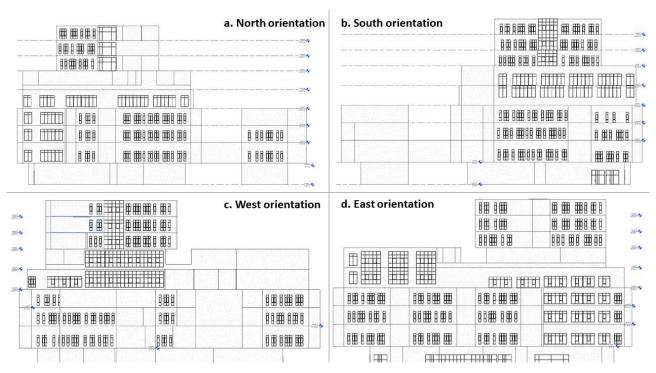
Facades of the UNU building: (a) north, (b) south, (c) west, (d) east
